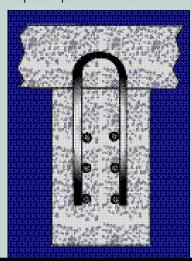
The joist has U-shaped ties for securing of concrete flooring.
